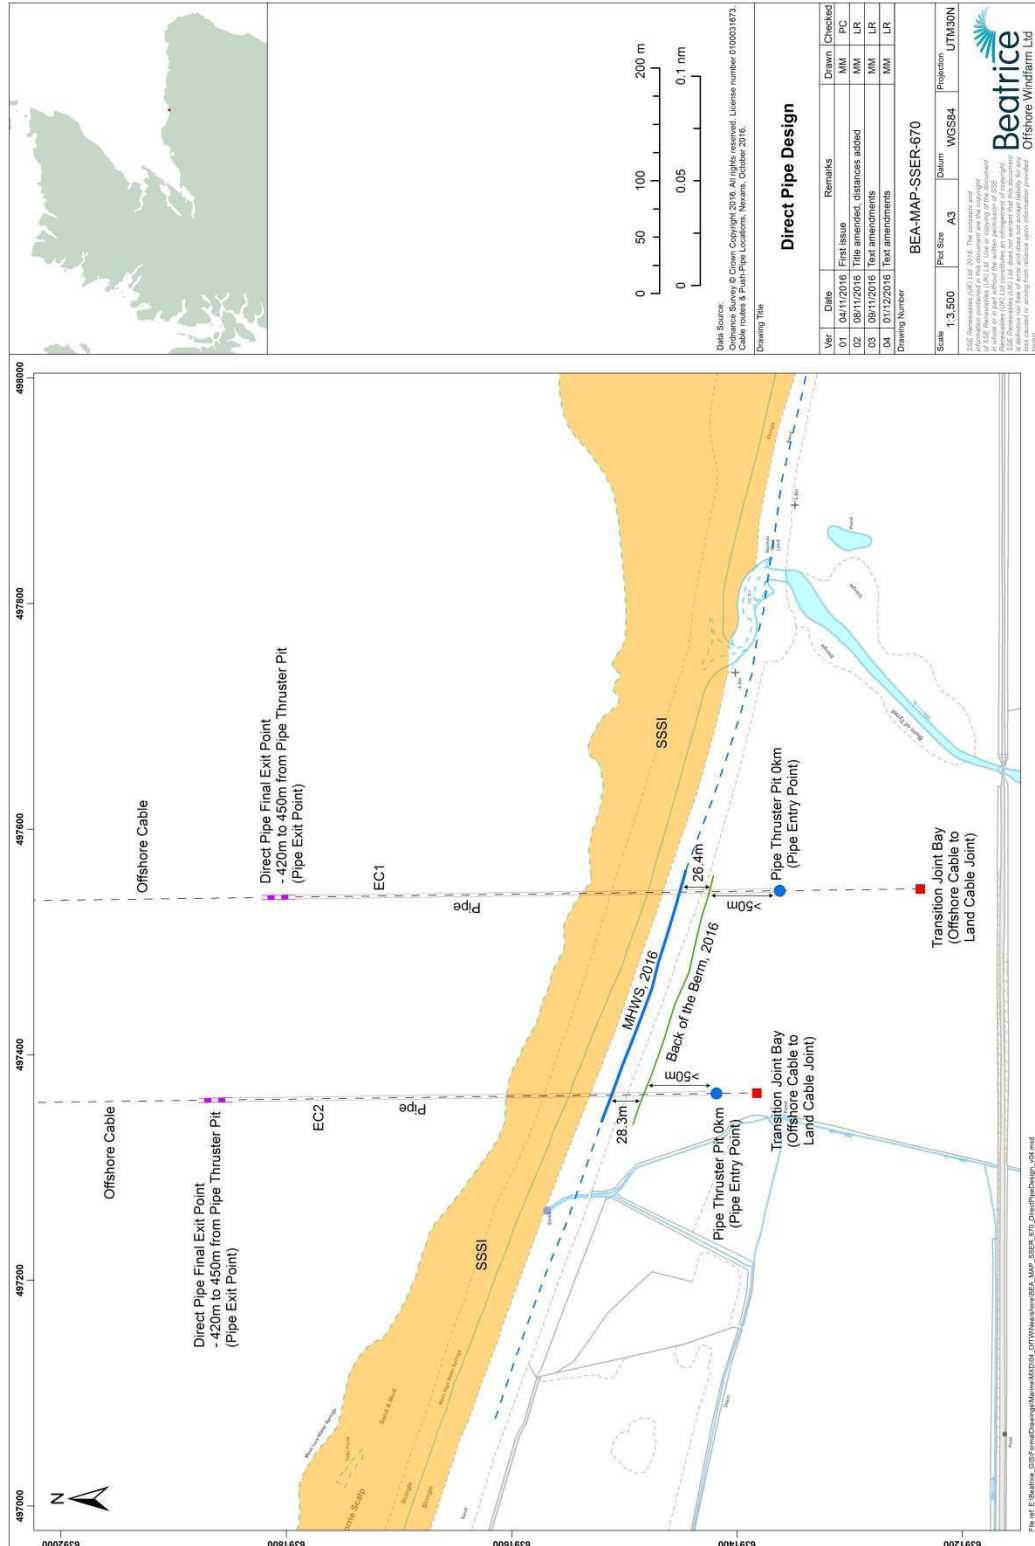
Key constraints relevant to the Export Cables (near-shore and landfall section of OTW corridor)
